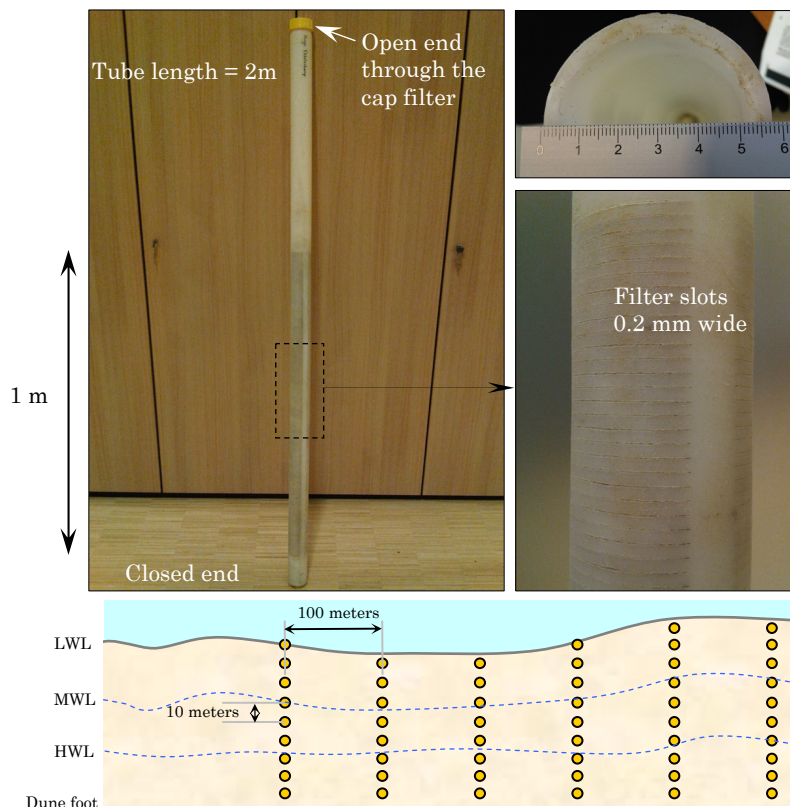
Details of the vertical drainage tube technology used at Ecobeach and Hvide Sande
